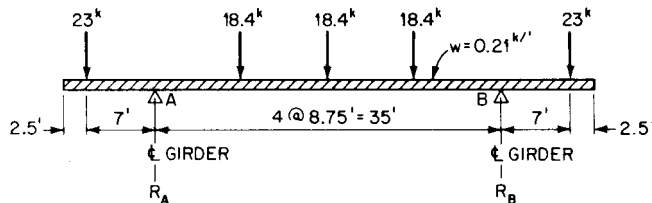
Dead loads on a floorbeam of the deck-girder bridge.
